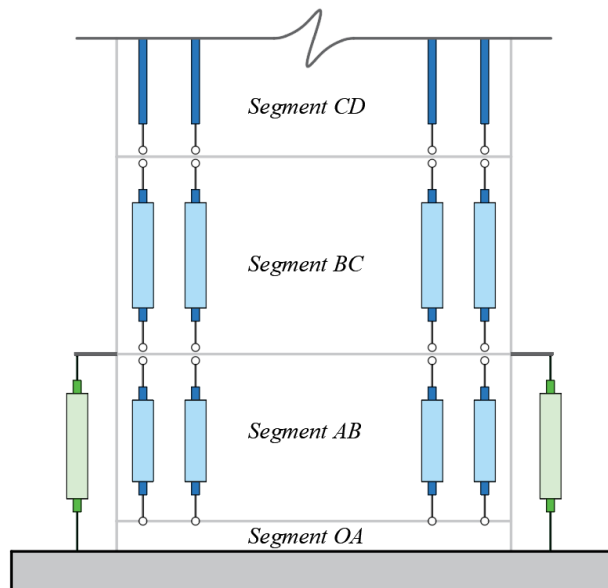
Typical layout of LVDTs over a wall specimen in the database
